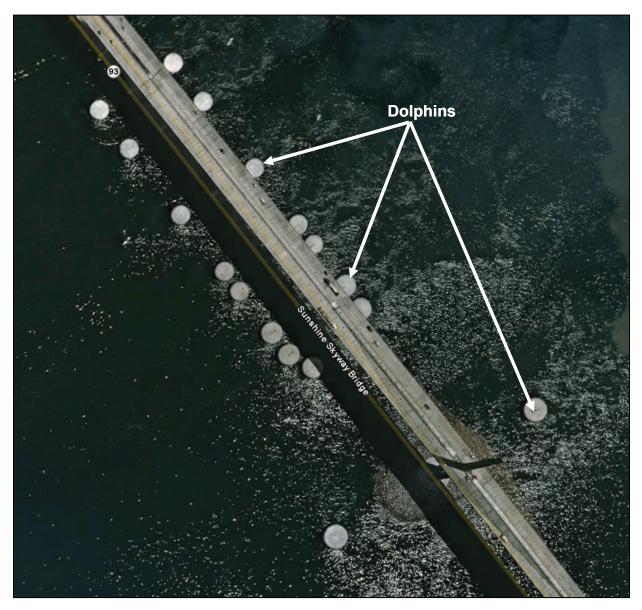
Dolphin Pier Protection at the Sunshine Skyway Bridge
